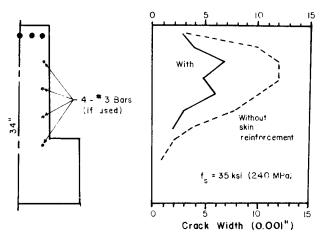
Side face crack profile of a single crack (1 in. = 25.4 mm)
